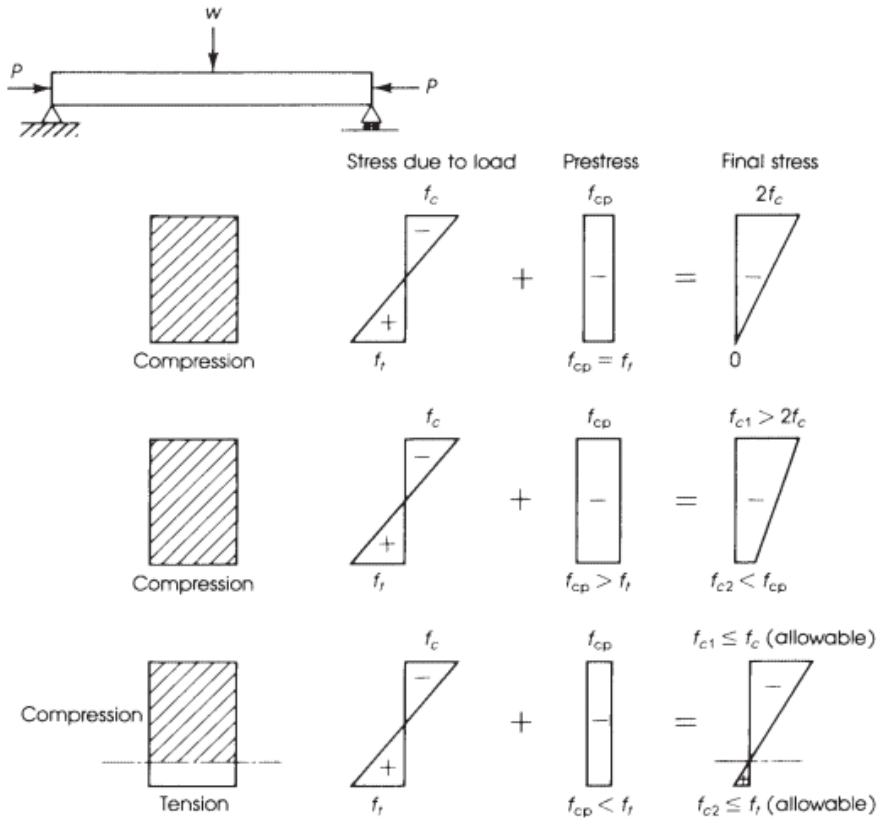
Prestressed concrete (Hassoun, 2012).
